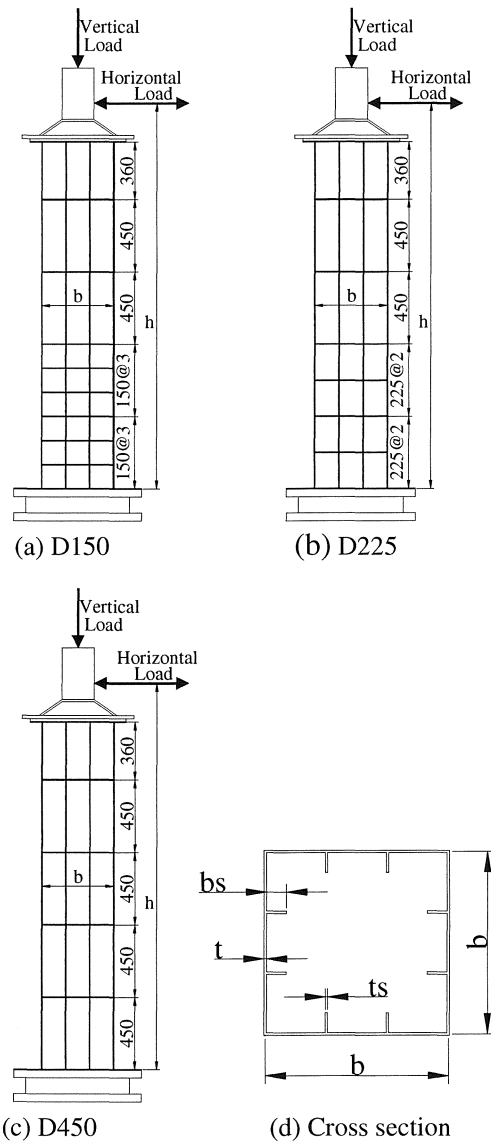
Side view (a) to (c) and cross-section (d) of test specimens.
